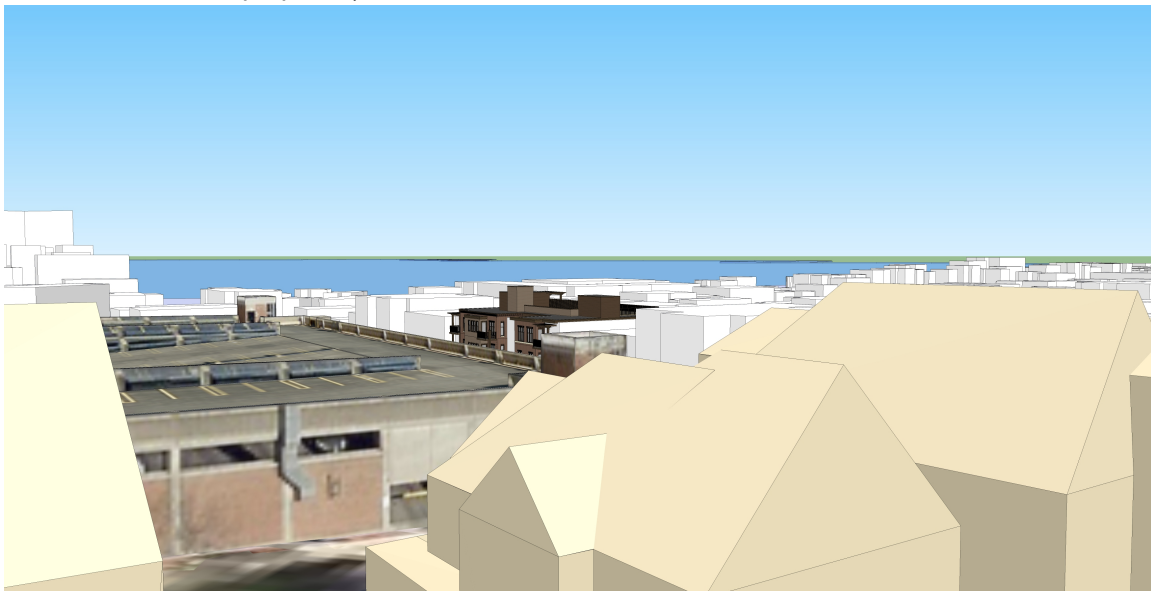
Third floor view of proposed building within same view as Image 5 above (Highest point of proposed building does not affect view to Lake Mendota beyond what is the current fabric of the surrounding neighborhood structures. If additional 4 story structures were placed between the proposed development and Lake Mendota, those structures would have greater impact on the view to the lake than this proposal.)
